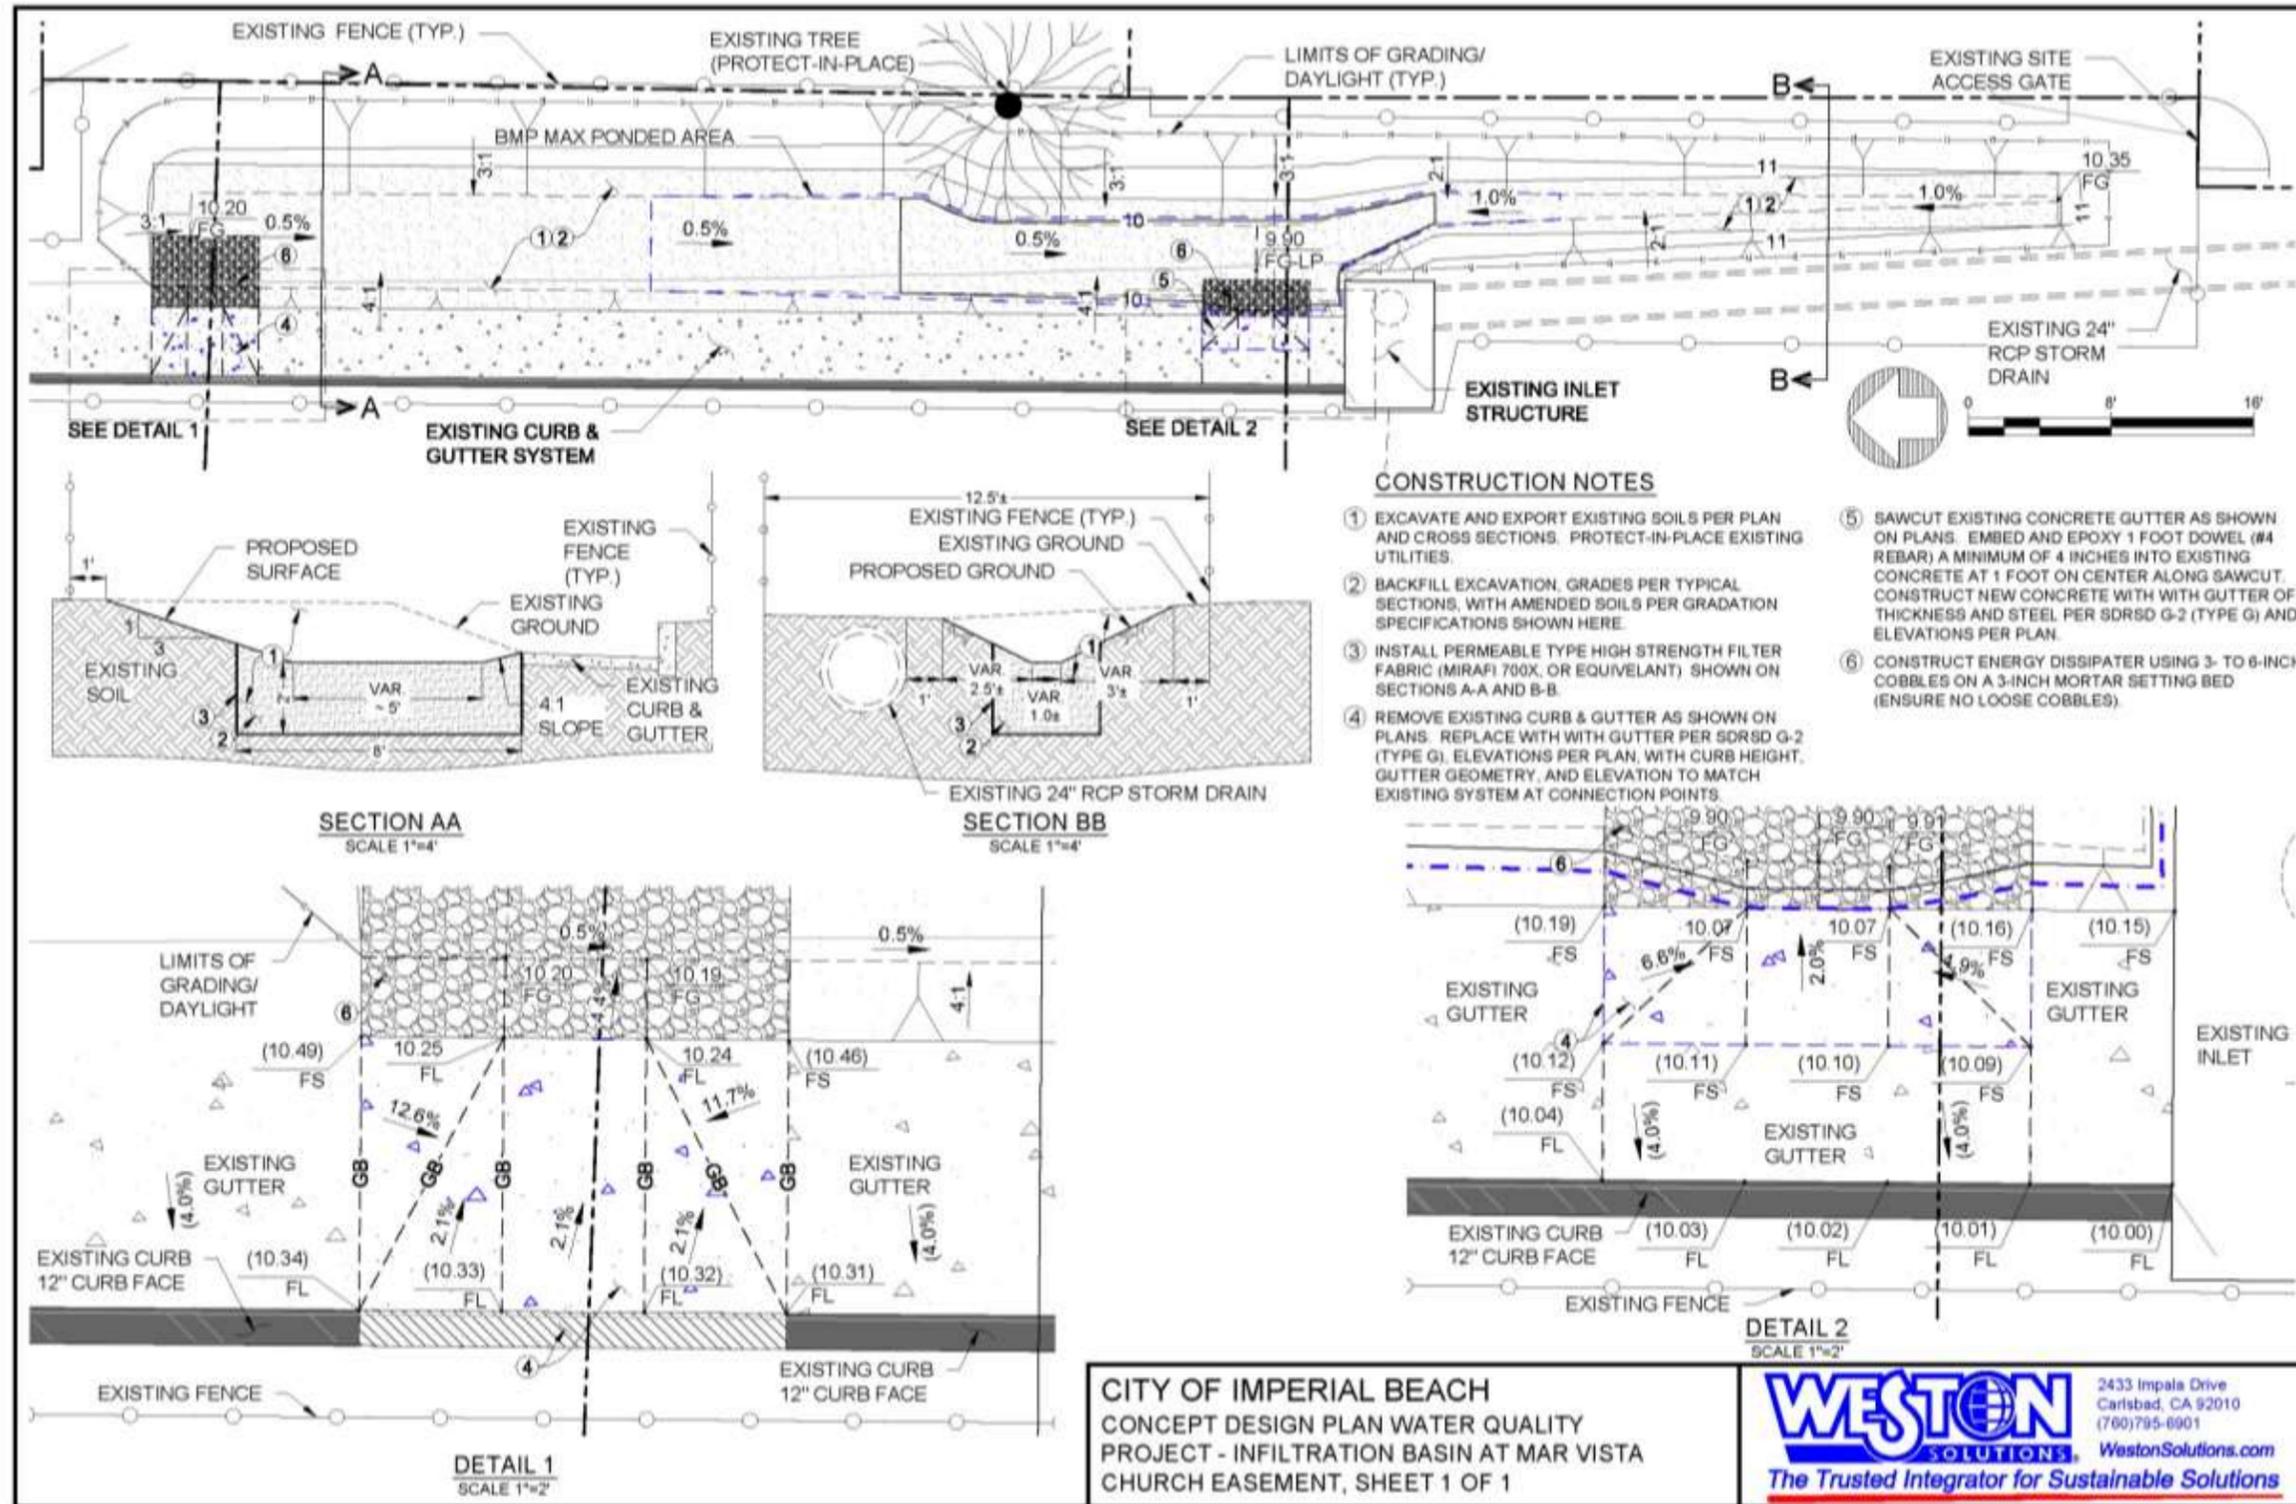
Mar Vista Church Drainage Easement Bioretention Basin Concept Design Plan
